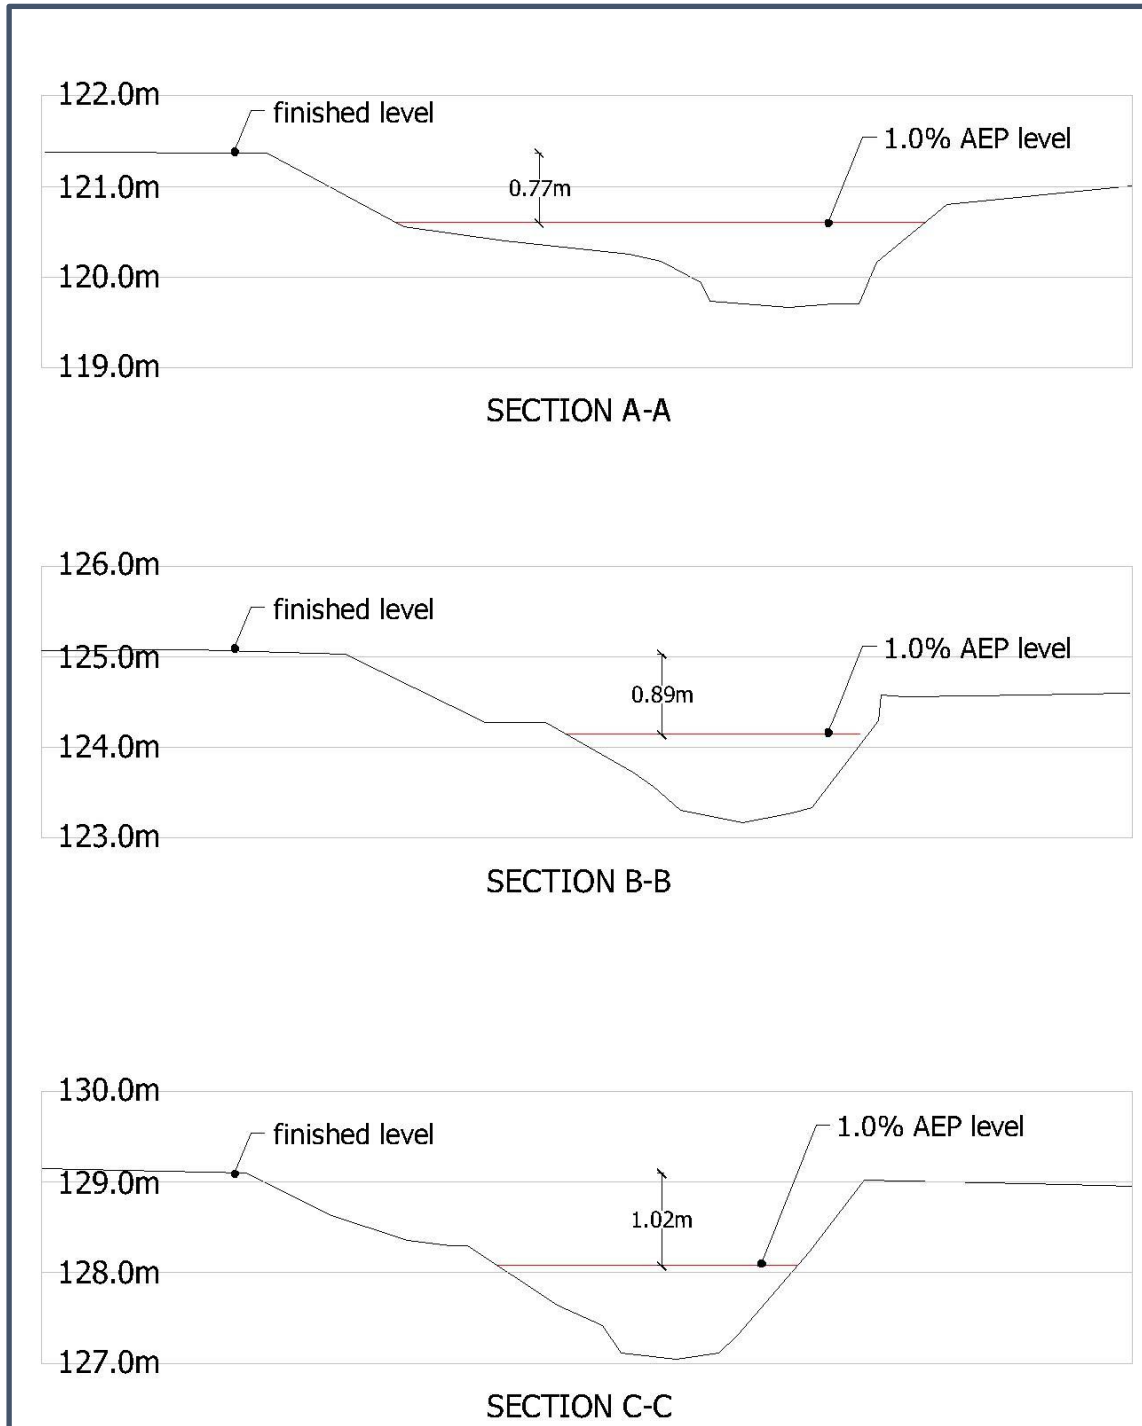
Sections showing 1.0% AEP flood level at Raised Bank
